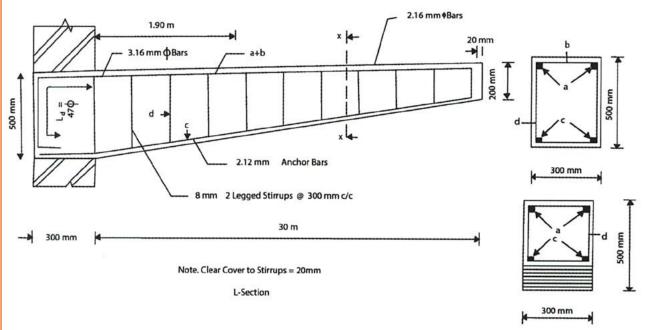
Reinforcement Details of a simply supported RCC cantilever beam
